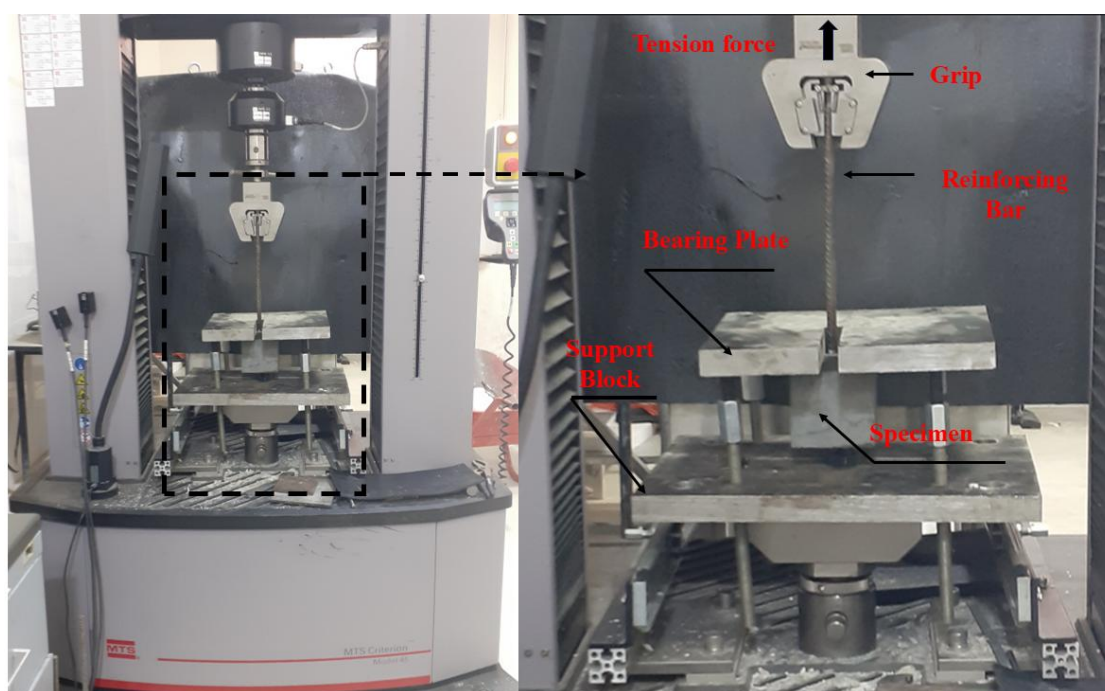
Pull-out test setup in the MTS machine, illustrating the specimen configuration and loading arrangement.
